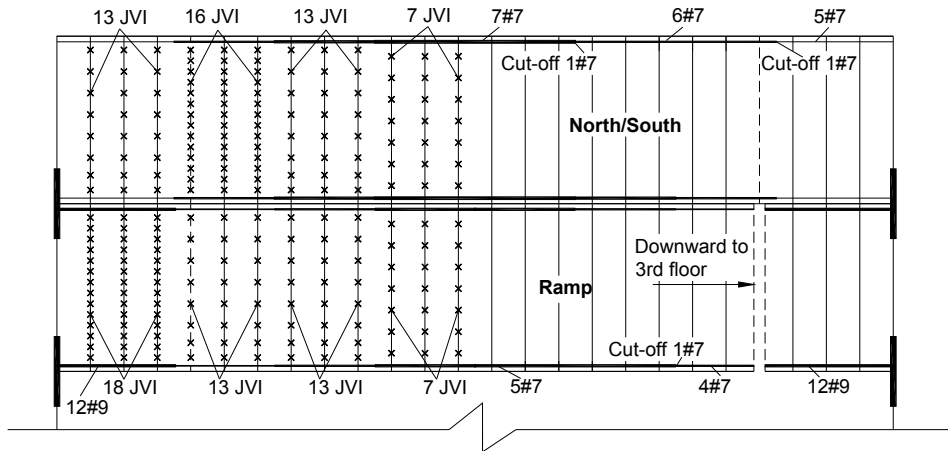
Diaphragm reinforcement at top floor for example 1C.
